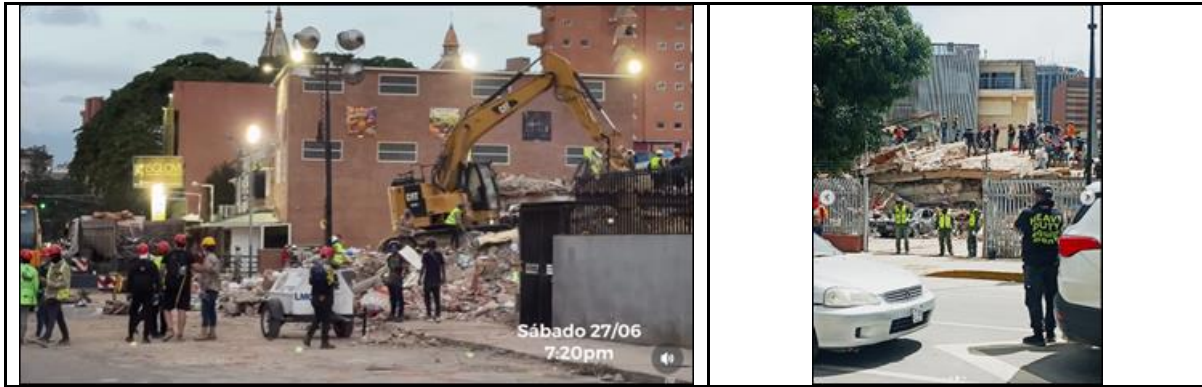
Edificio SJT (left) -a collapsed 7-storey residential RC building, and Edificio Obelisco- a collapsed 4-storey residential RC building.
